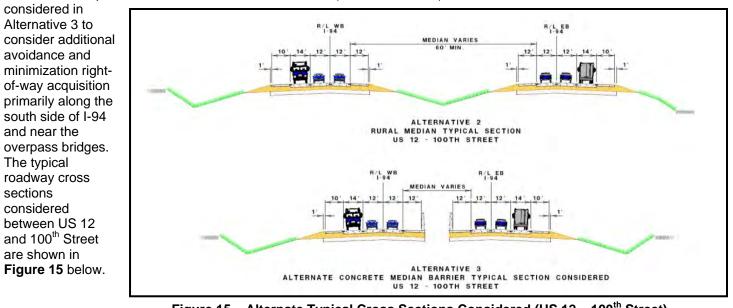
Alternate Typical Cross Sections Considered (US 12 – 100th Street)
